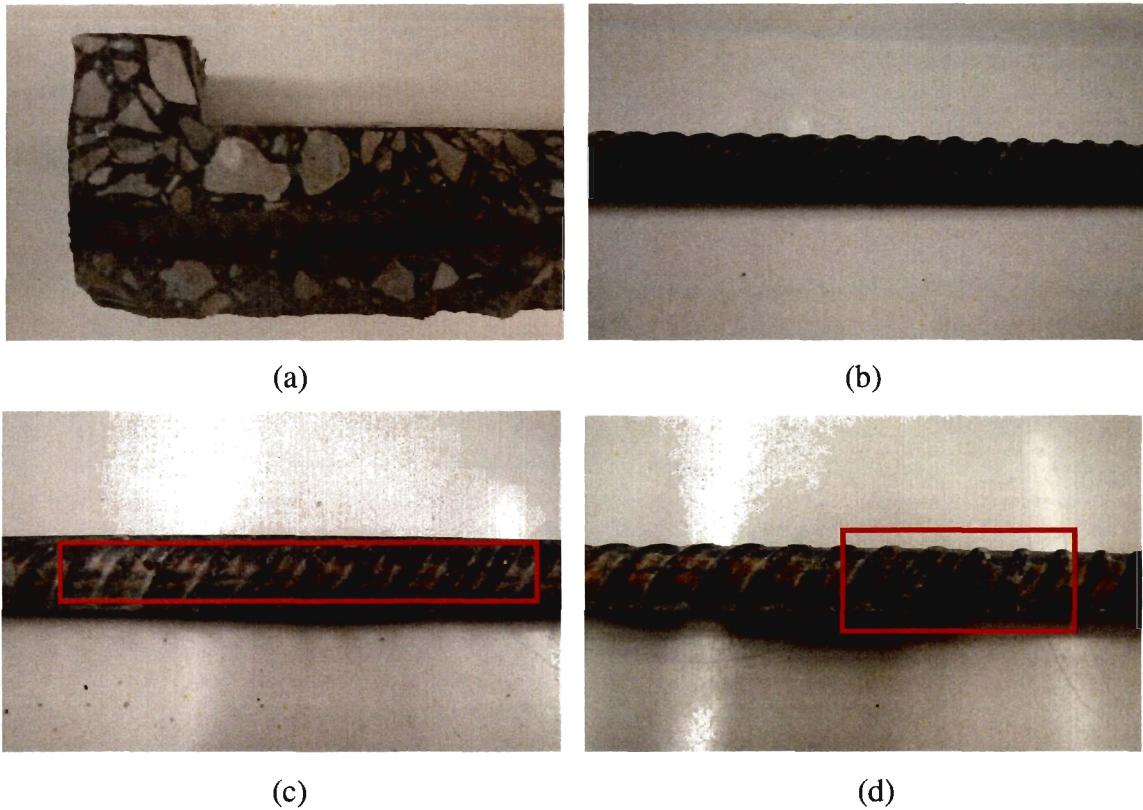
Reinforcement examination of Mix No. 1 containing 2 bars.
